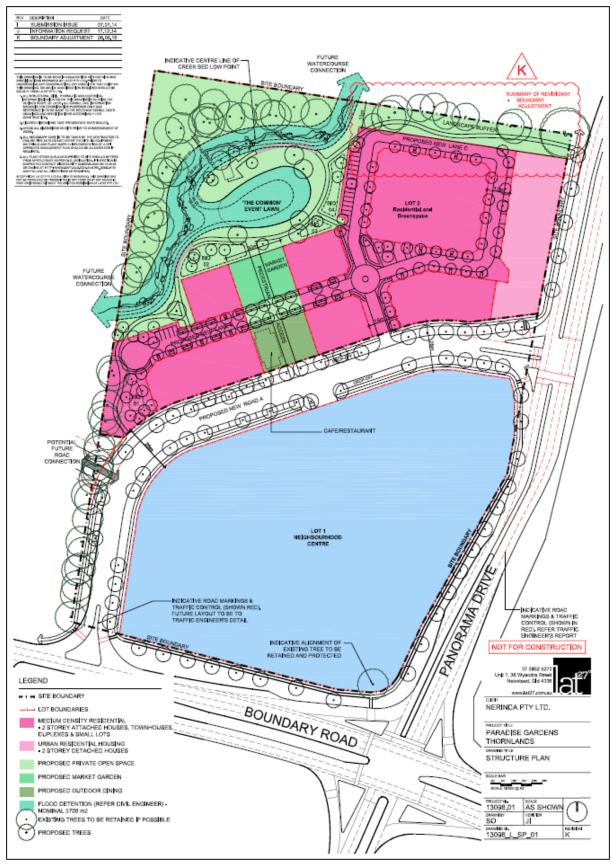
PARADISE GARDENS STRUCTURE PLAN (26-6-15)
